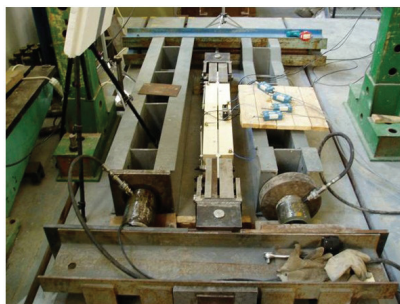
Samples ready for the load bearing tests on the testing bench.
